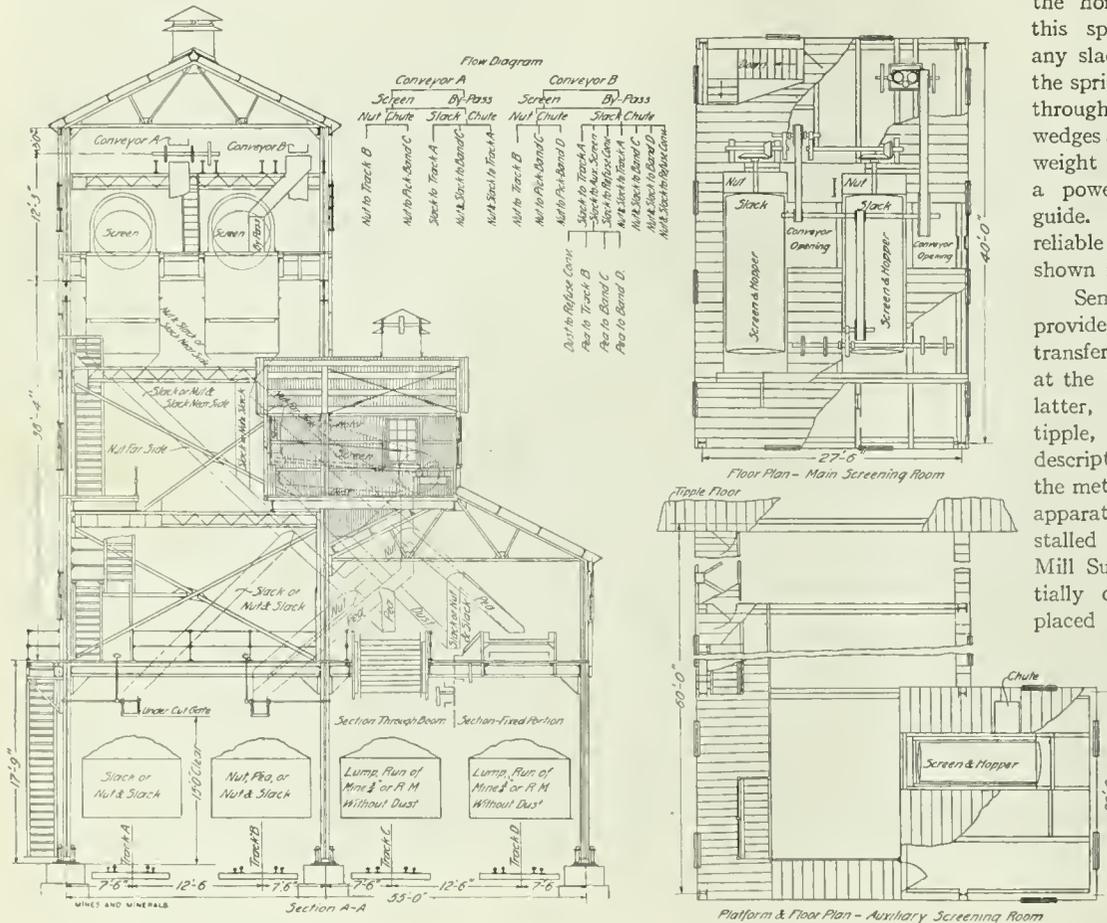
PLAN, SECTIONS, AND FLOW SHEET OF TIPPIE, ANNABELLE MINE
